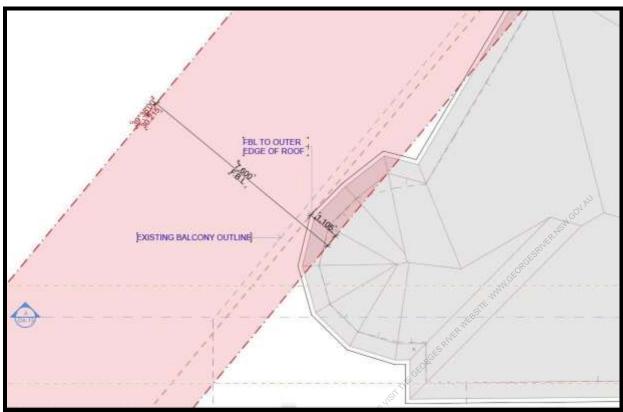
The extent of roof works within foreshore building line demonstrate maximum encroachment of 1105mm.
